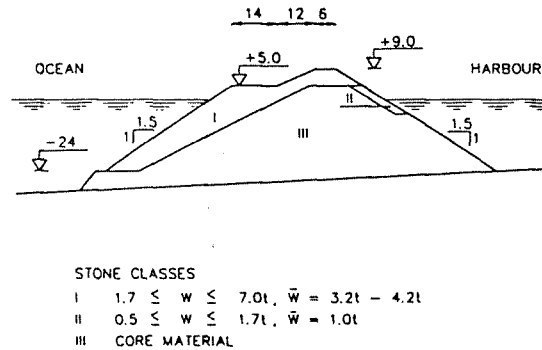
Cross-section of a berm breakwater at Keflavik. (Based on figure from Baird (1987)). All measures are in metres.
